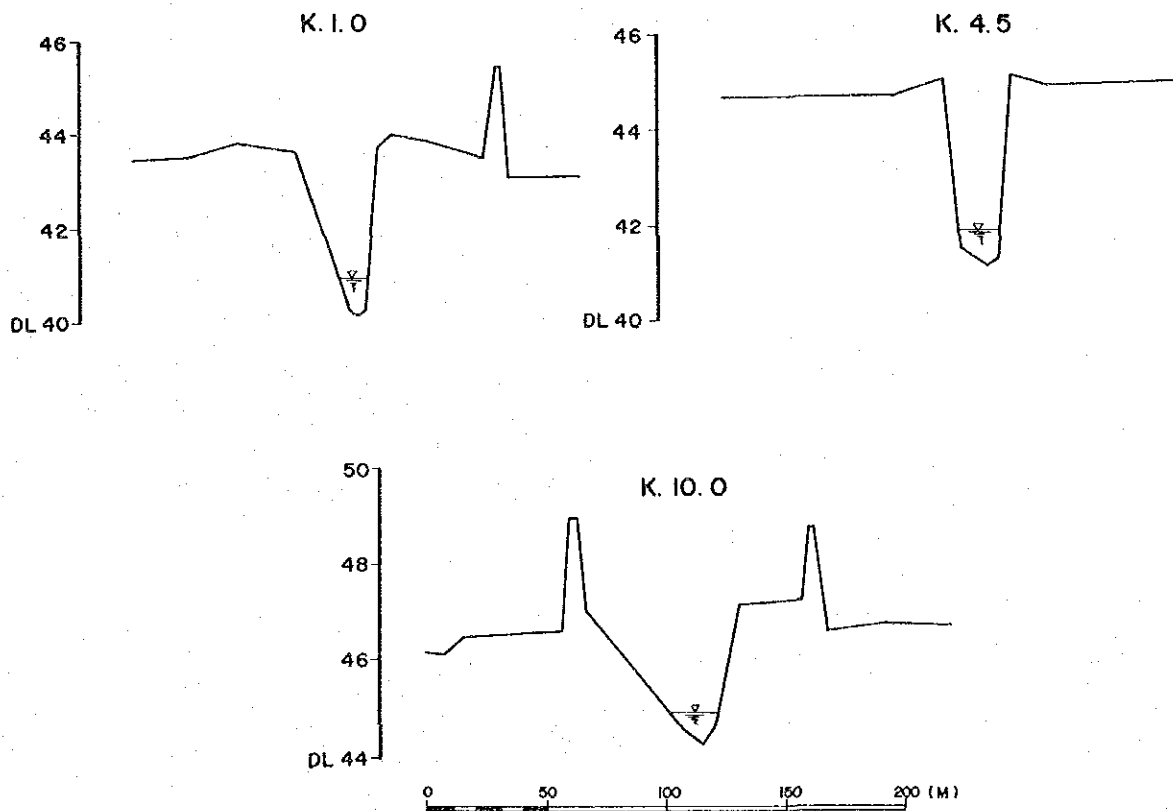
TYPICAL CROSS-SECTIONS OF THE EXISTING K. KEDUNGSOKO (3 / 5)
